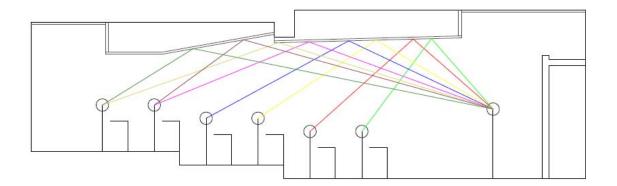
Section of Lecture Hall – Proposed Ceiling with Sound Reflection
